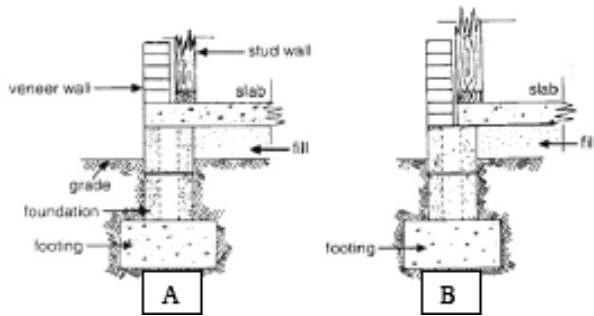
Supported slab construction shows the slab extending completely over the top of the foundation wall (A) and the slab resting on a portion of the foundation wall (B). (illustration courtesy of MSUE)
